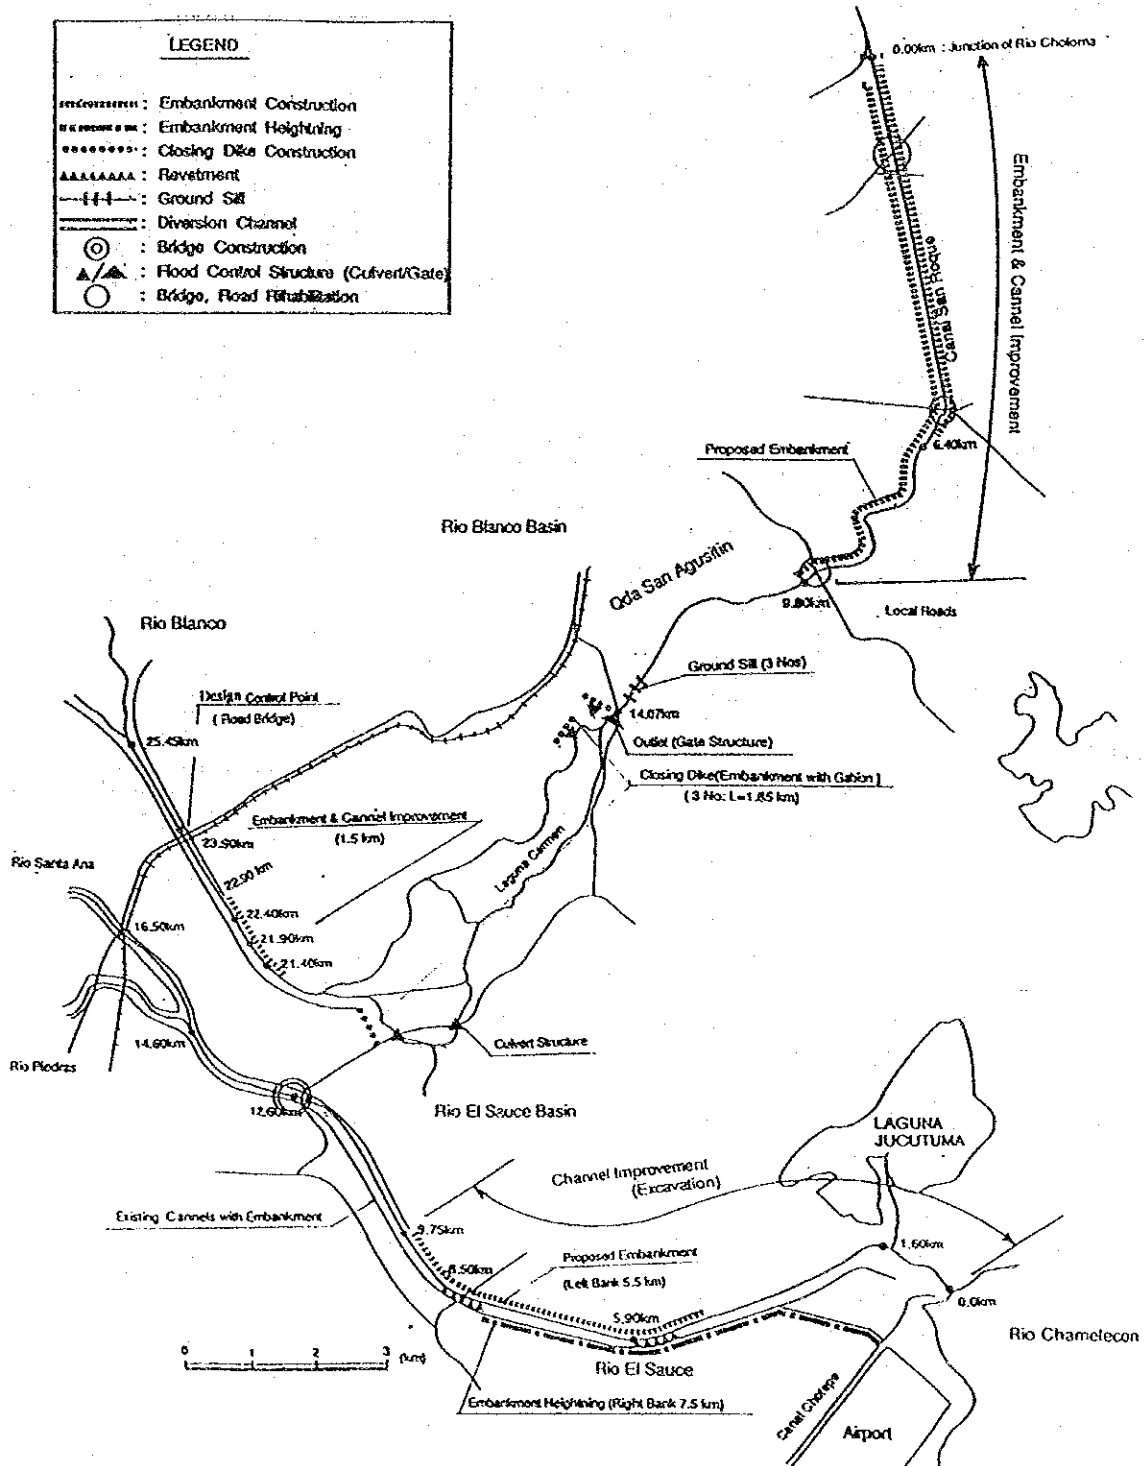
PROPOSED FLOOD MITIGATION FACILITIES OF THE RIO BLANCO AND EL SAUCE (ALTERNATIVE 1)
